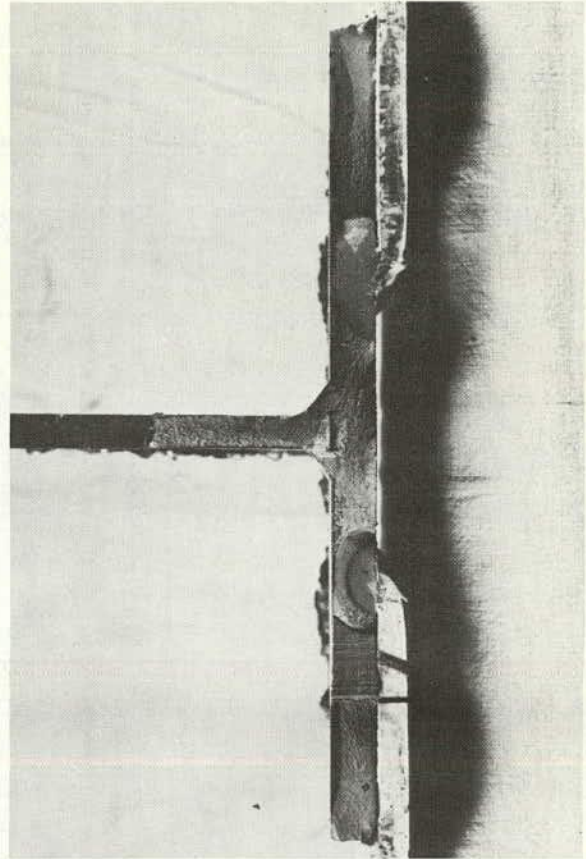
Typical fatigue crack surface at flange attachment with longitudinal weld
